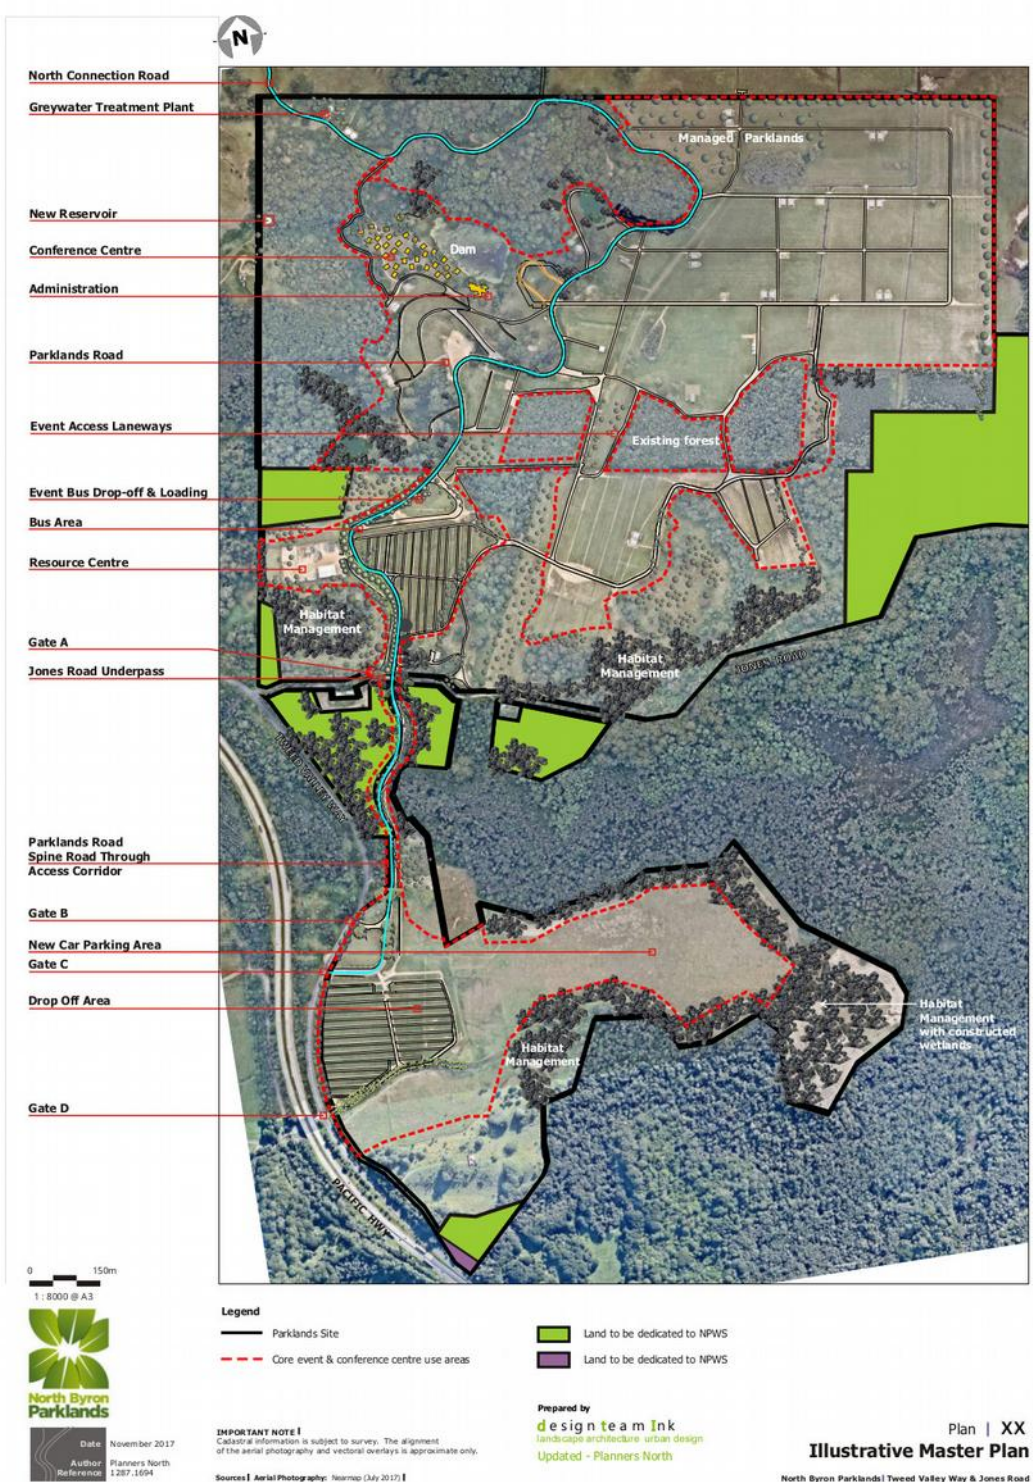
Illustrative Master Plan – Parklands Permanent Application
